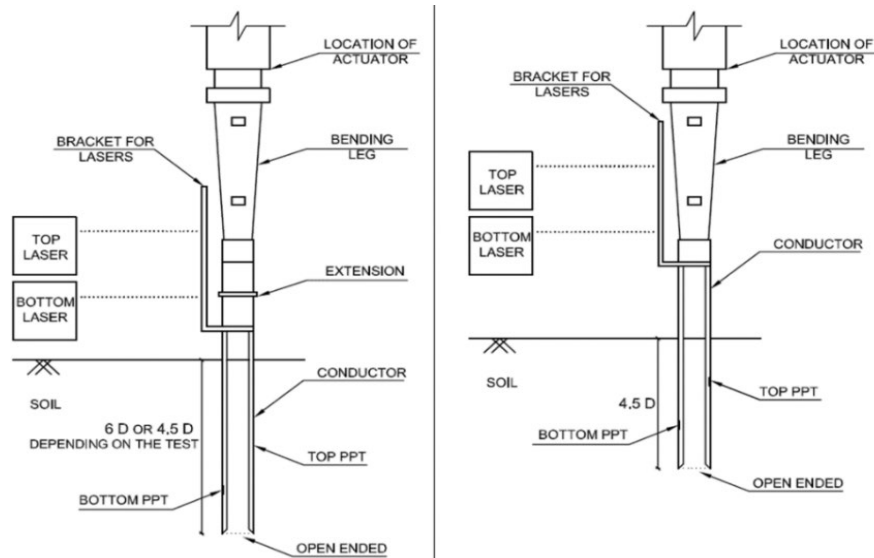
Diagram of test setup: (a) First campaign setup: (b) Second campaign setup.
